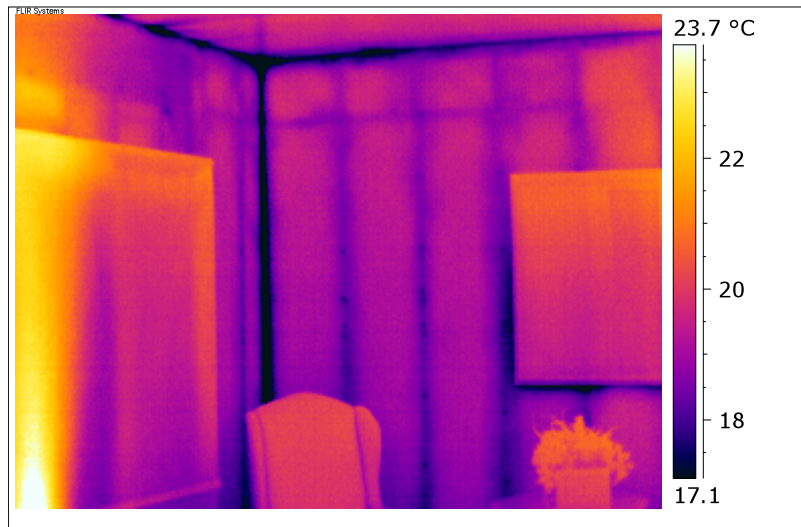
Wall studs hidden behind the drywall are clearly visible
